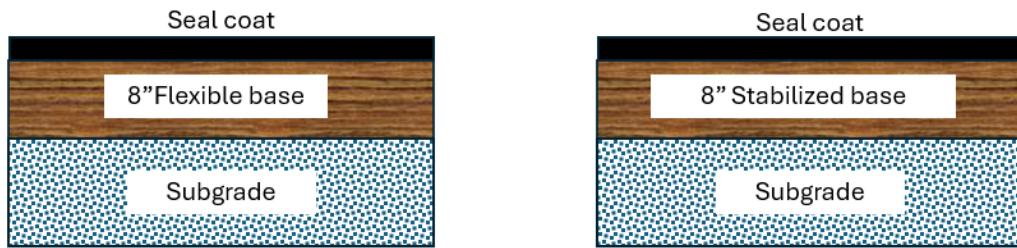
Two Pavement Structure Alternatives in the FM 521 Case Study.
